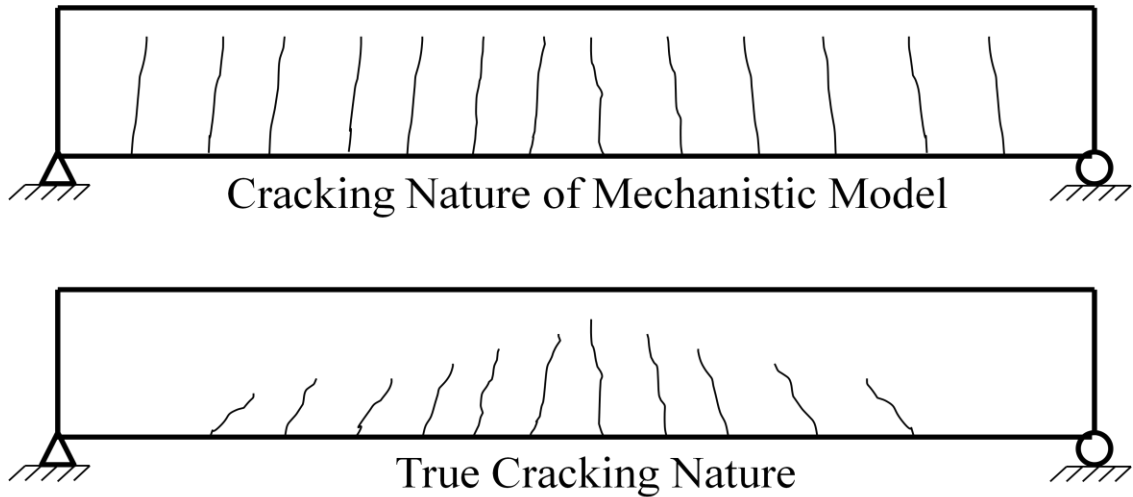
Assumed and realistic cracking phenomenon of concrete beams
